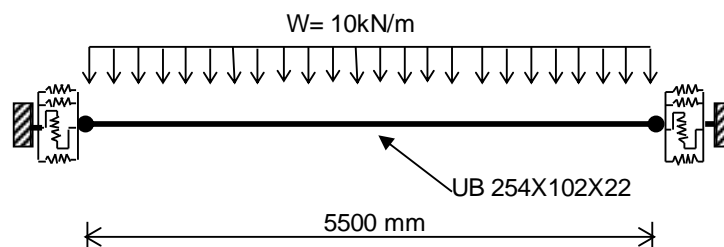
Isolated beam with connection elements, with hinged end, fixed in position.
